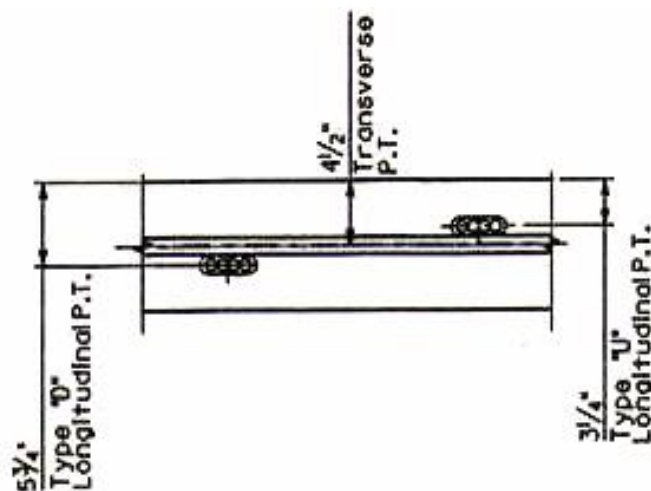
Arrangement of intersecting transverse and longitudinal post tensioning
